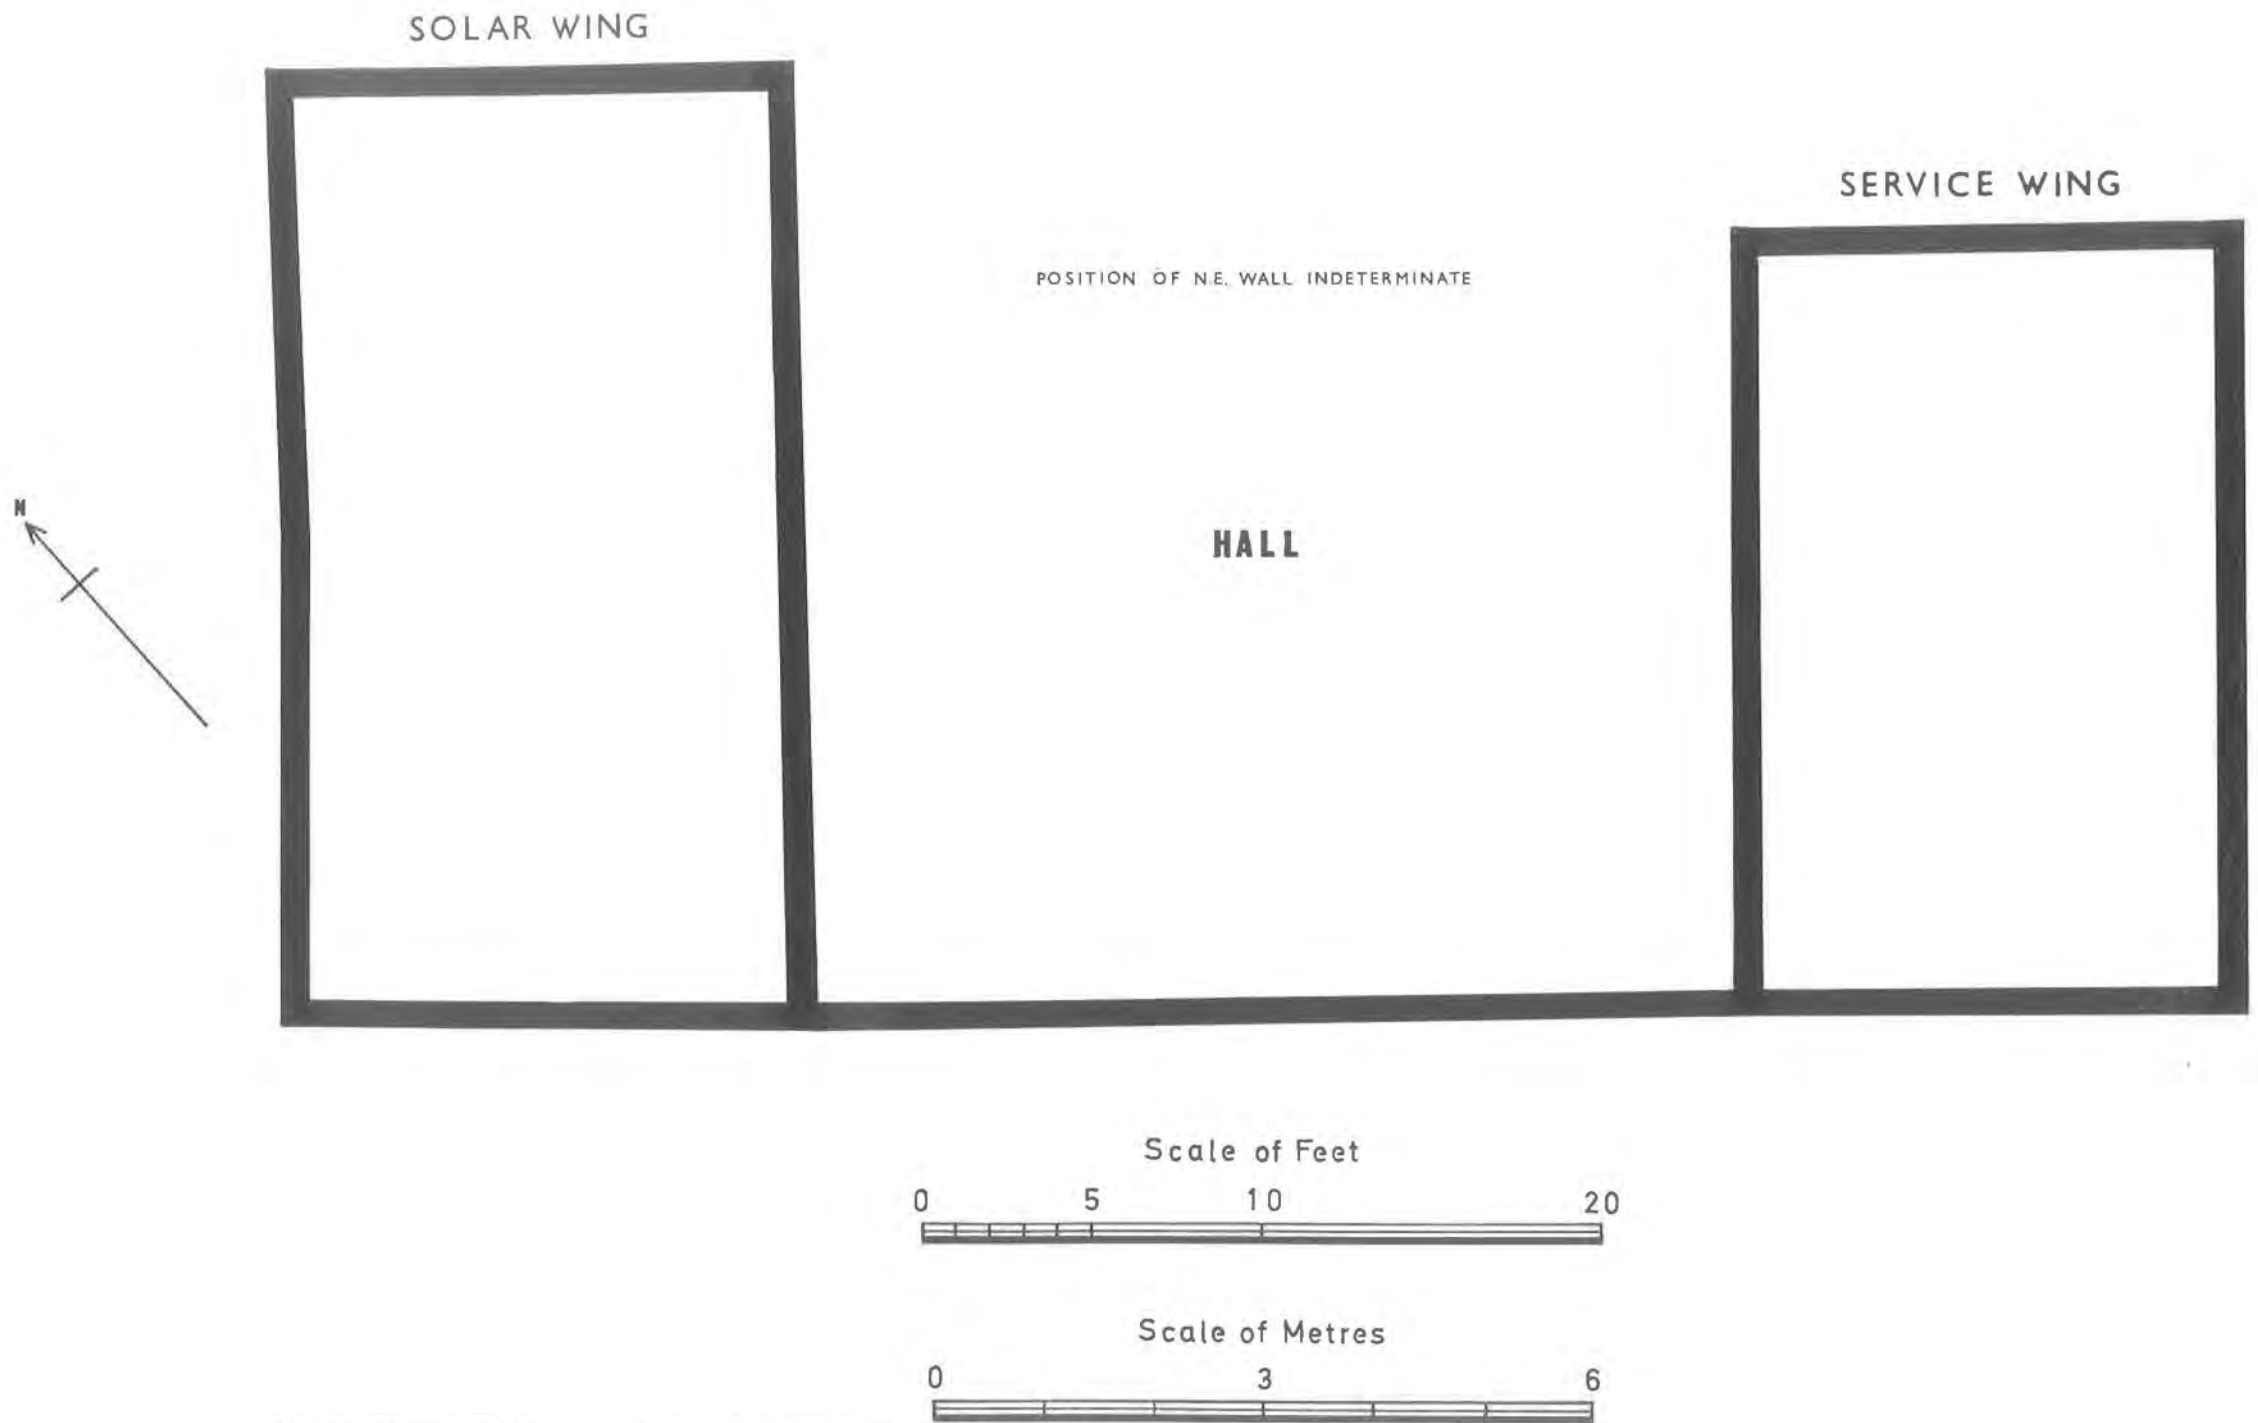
Phase 1. Position of north-east hall wall, doors and windows indeterminate.
